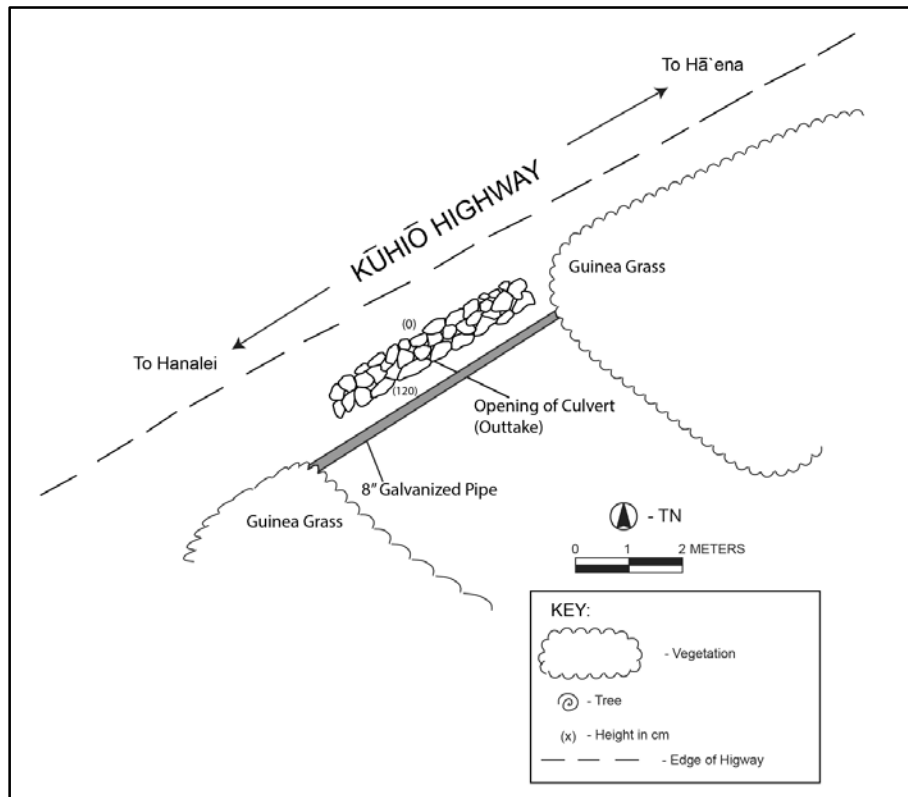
SIHP # 50-30-02-2299, illustrated plan view of outtake culvert
